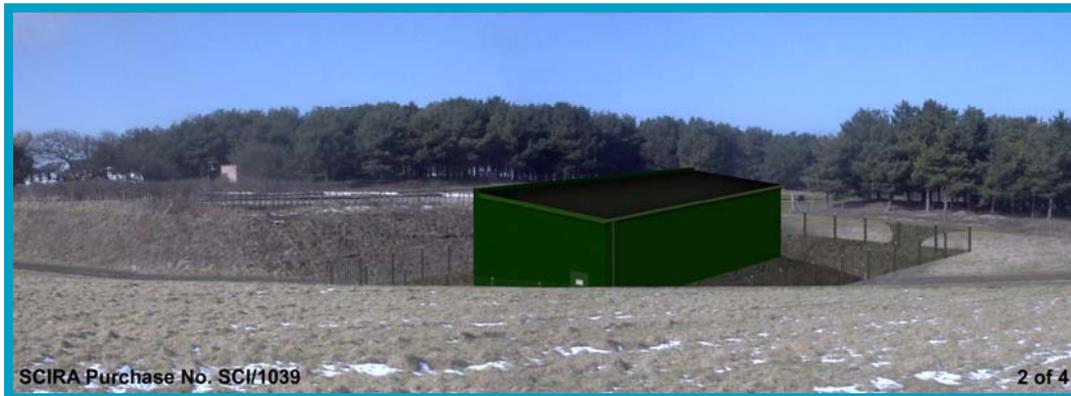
d Photomontage of proposed new Switch Room Building at “The Muckleburgh Collection” Weybourne, Norfolk (viewed from south).
